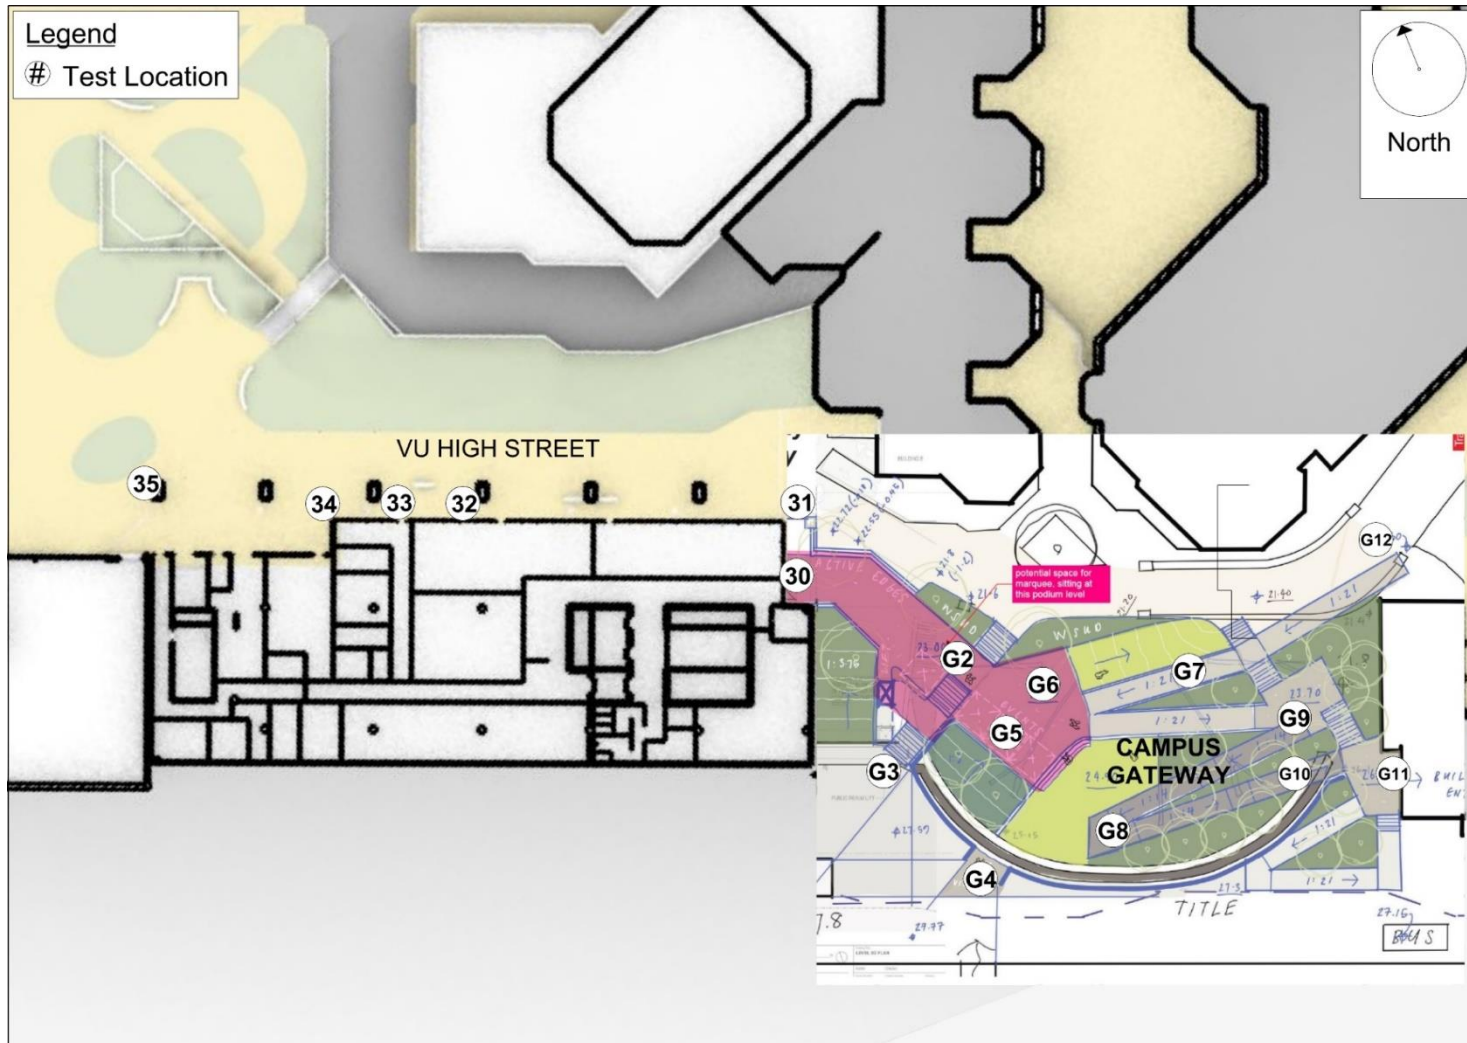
Test Locations along the VU High Street Frontage and Campus Gateway Open Space of the proposed VU CHTF Development.
